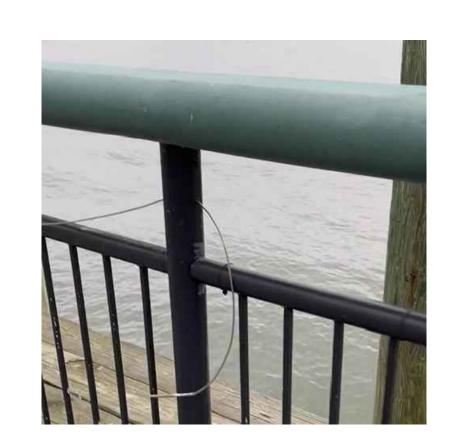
WEST PERIMETER HANDRAILS LOSE AND LOST TENSION CABLE
